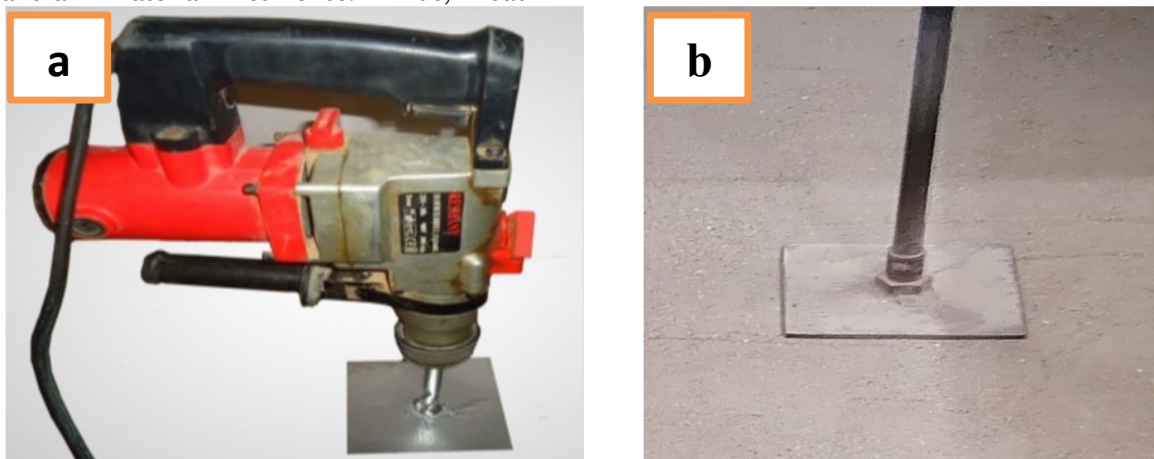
(a) Modified Compactor, (b) Tamping Rod.
